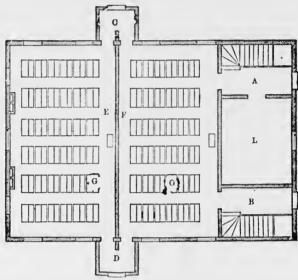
GROWND PLAN OF GIRLS' DEPARTMENT, ADAPTED TO FIG. 127.
